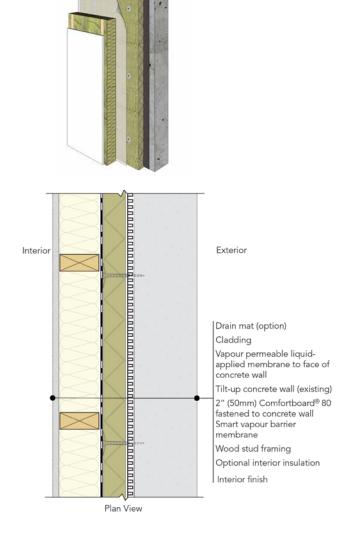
ROCKWOOL Comfortboard installed on the interior of an existing concrete tilt-up construction, with optional batt insulation installed between a wood frame
